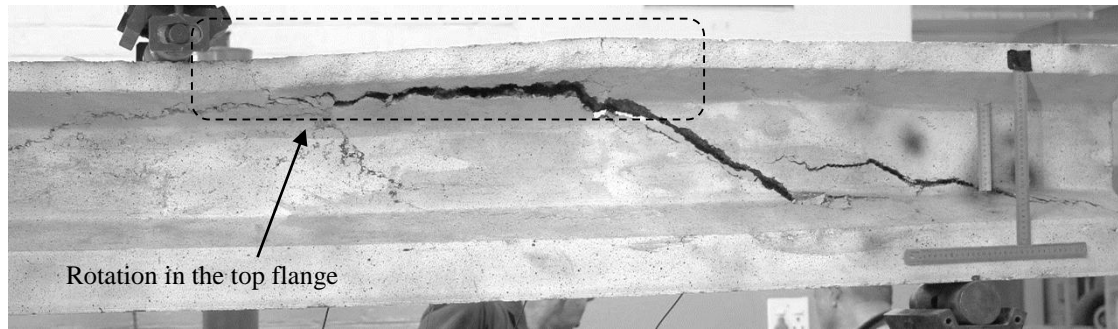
Concrete struts at the left shear span UHPFRC prestressed beam containing dolomite
